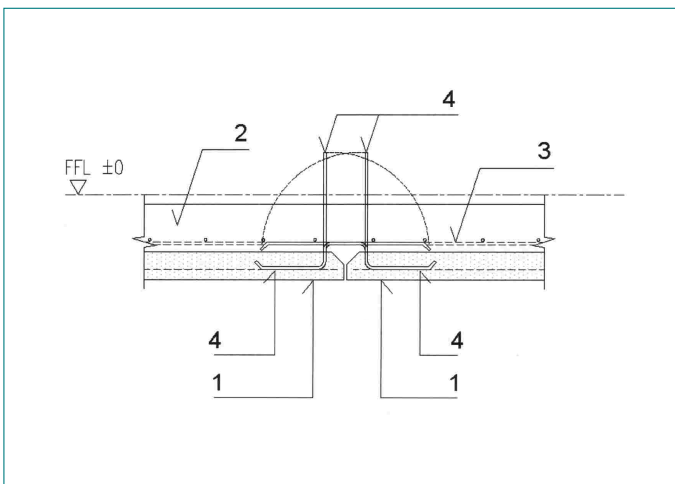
Use of stiffened cast in-situ pour strip to connect precast full slabs
